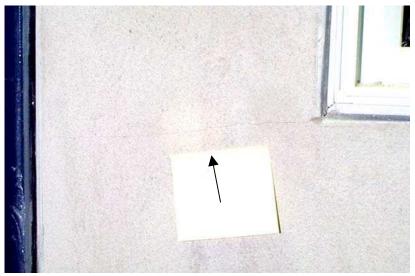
Crack at the bottom corner of the window (see arrow on sticker)
